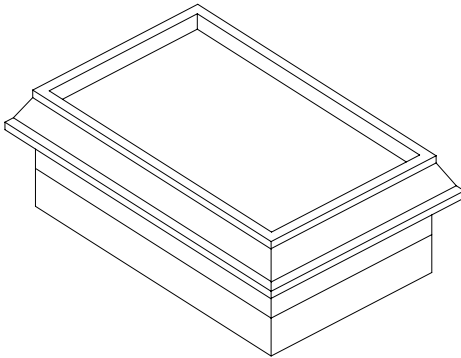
A.3.D.II. MINIMUM MANSARD ROOF HEIGHT
